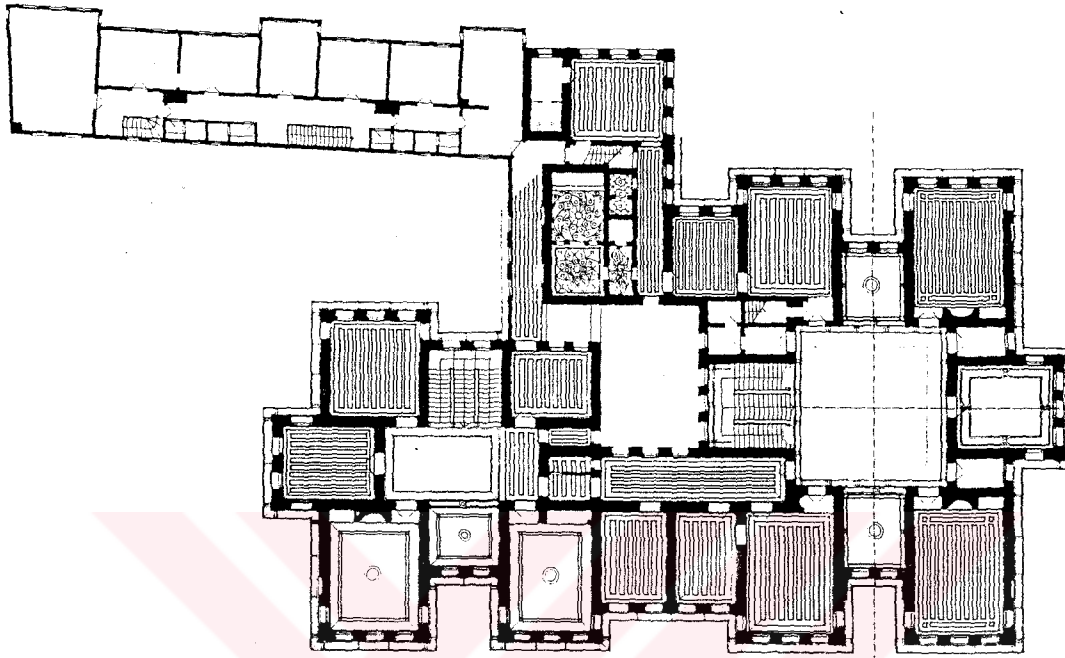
Plan of the Hatice Sultan Palace, 1829.
